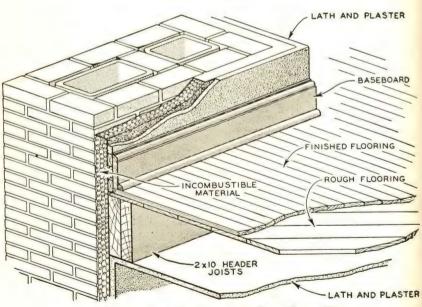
Chimney Insulation Required in Wood Frame Houses
